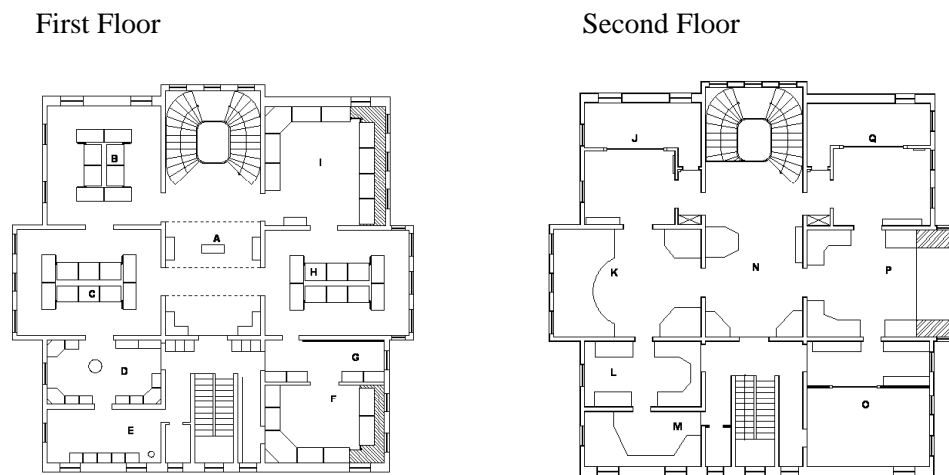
Floor Plans and Designs of the Chosen Setting
